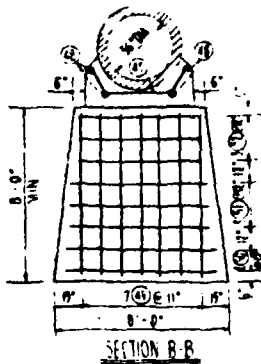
DETAIL OF REINFORCED CONCRETE ANTI-SEEP COLLAR - 6 REQ.
